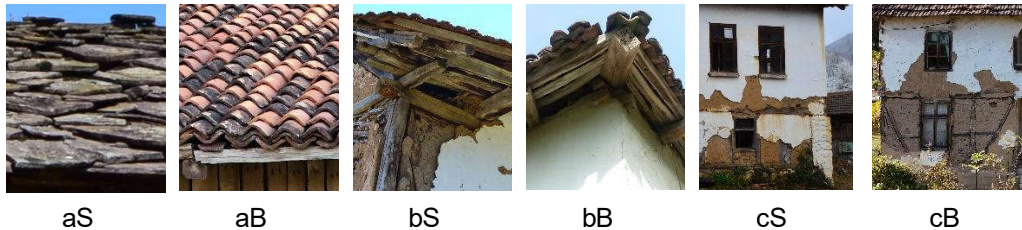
Comparison of roof construction, roof covering and façade design from left to right: S- Serbian villages, B- Bulgarian villages, sources: authors
